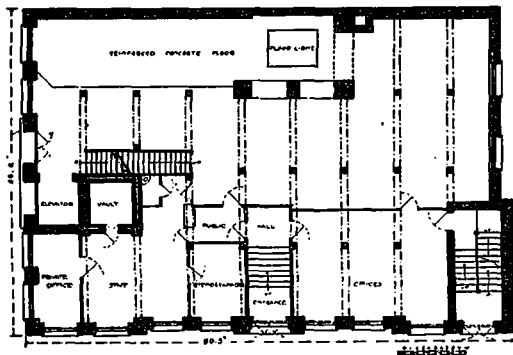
GROUND FLOOR PLAN, SHUTTLEWORTH BUILDING, TORONTO. R. J. EDWARDS & SAUNDERS, ARCHITECTS.
